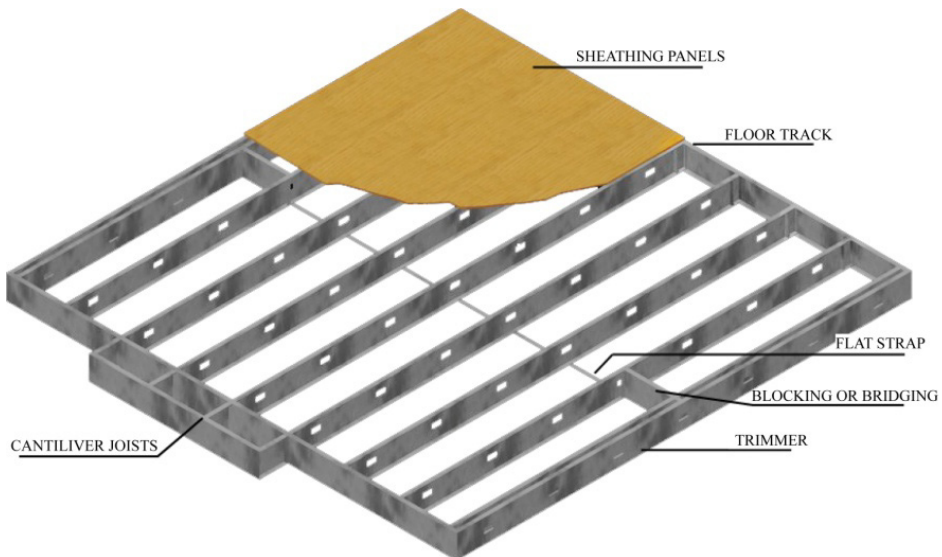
Typical floor framing (Iuorio, 2009)
